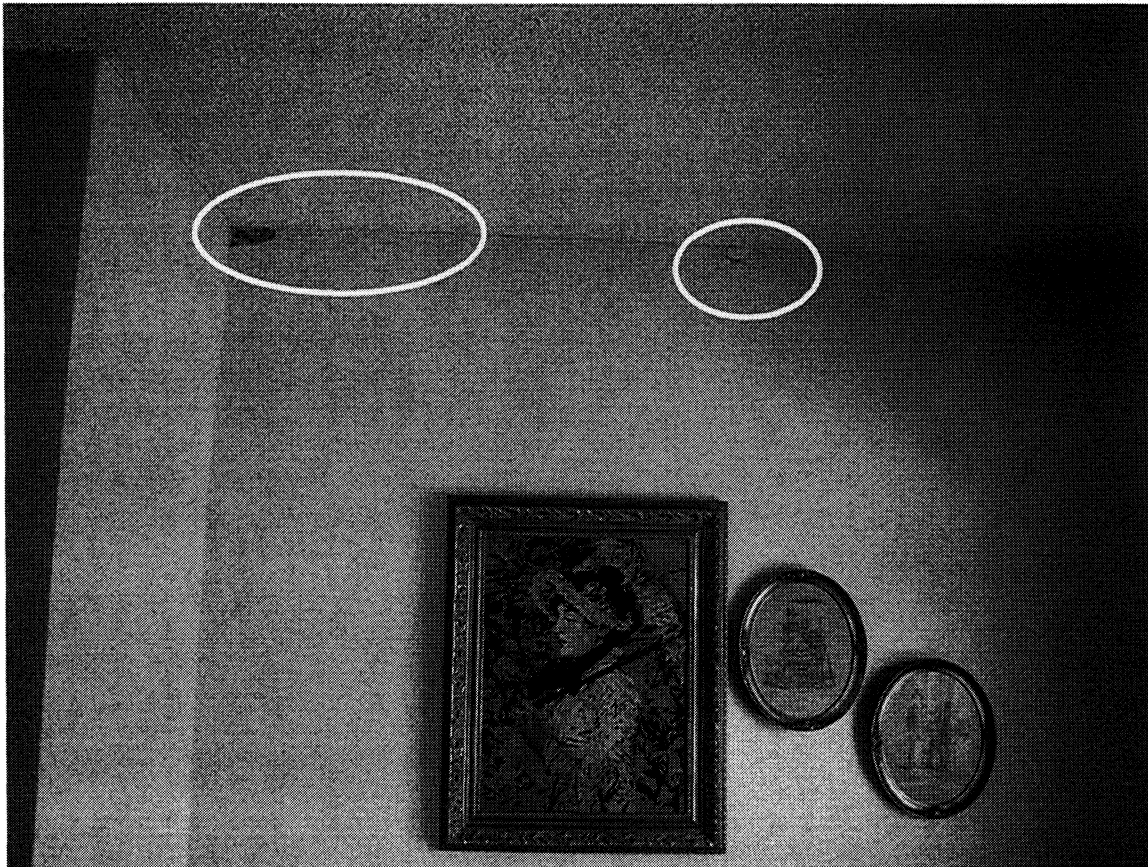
damaged interior wall (5th floor) as a result of the scaffolding banging against the exterior of the building
